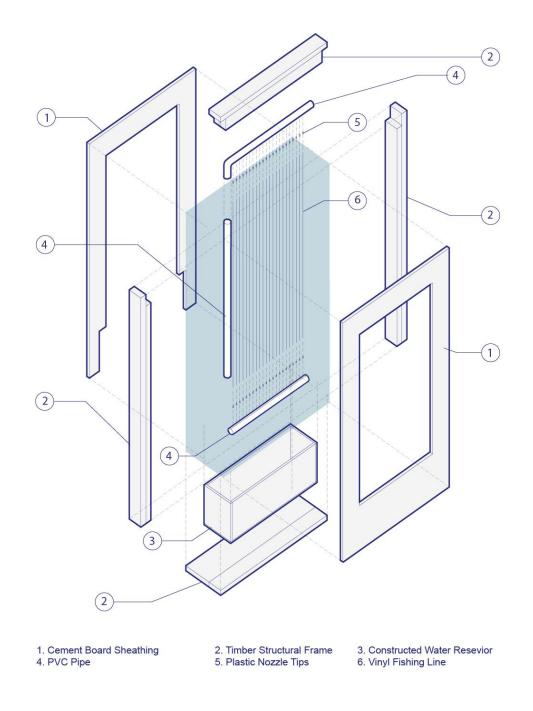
Exploded Axonometric Diagram Prototype. Source: Author.
